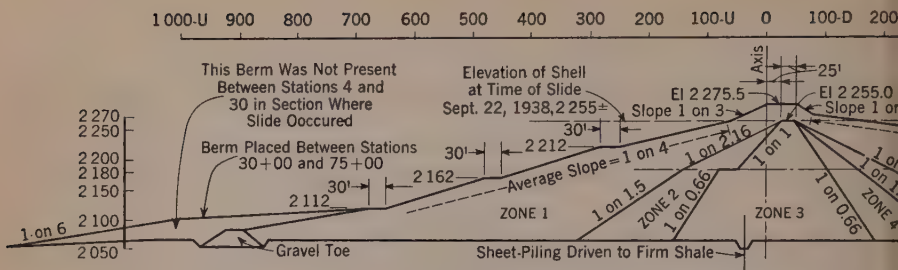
TYPICAL CROSS SECTION OF FORT PECK DAM
